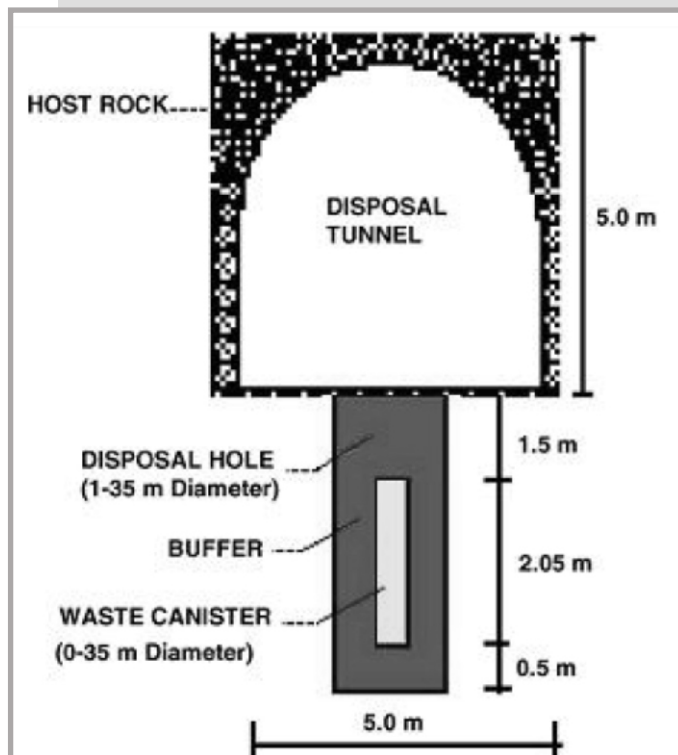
Cross section of a disposal tunnel with the vertical emplacement of waste overpacks in the disposal hole.
